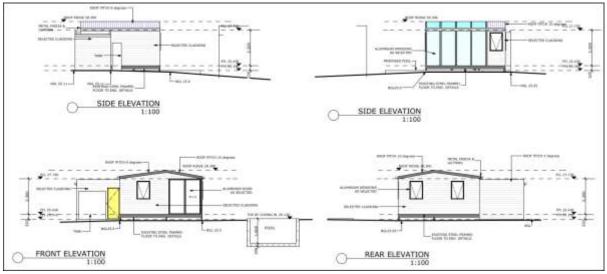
Proposed elevations (clockwise from top left: north; south; east west)
